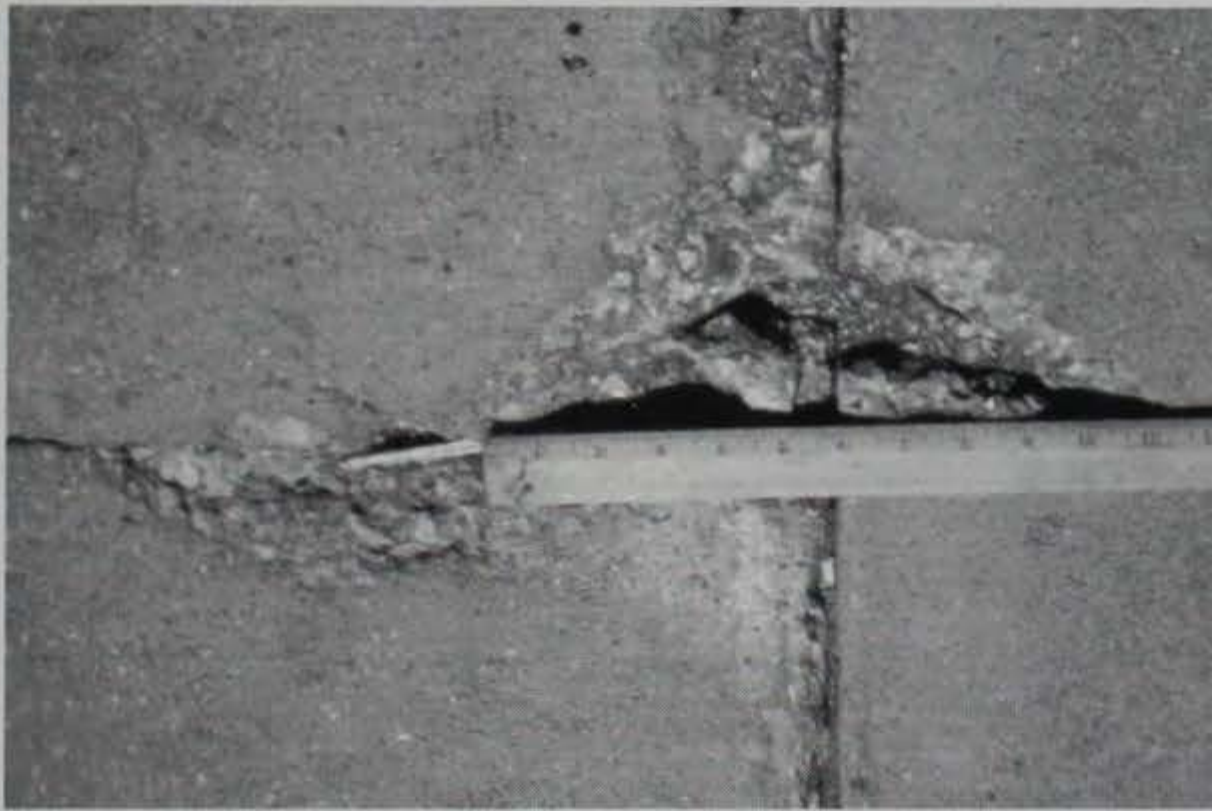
Medium-Severity Spalling, Corner.
